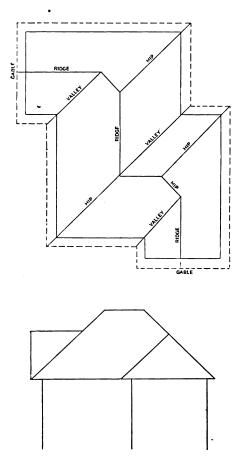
Plan and Elevation Contributed by "H. A. L."
